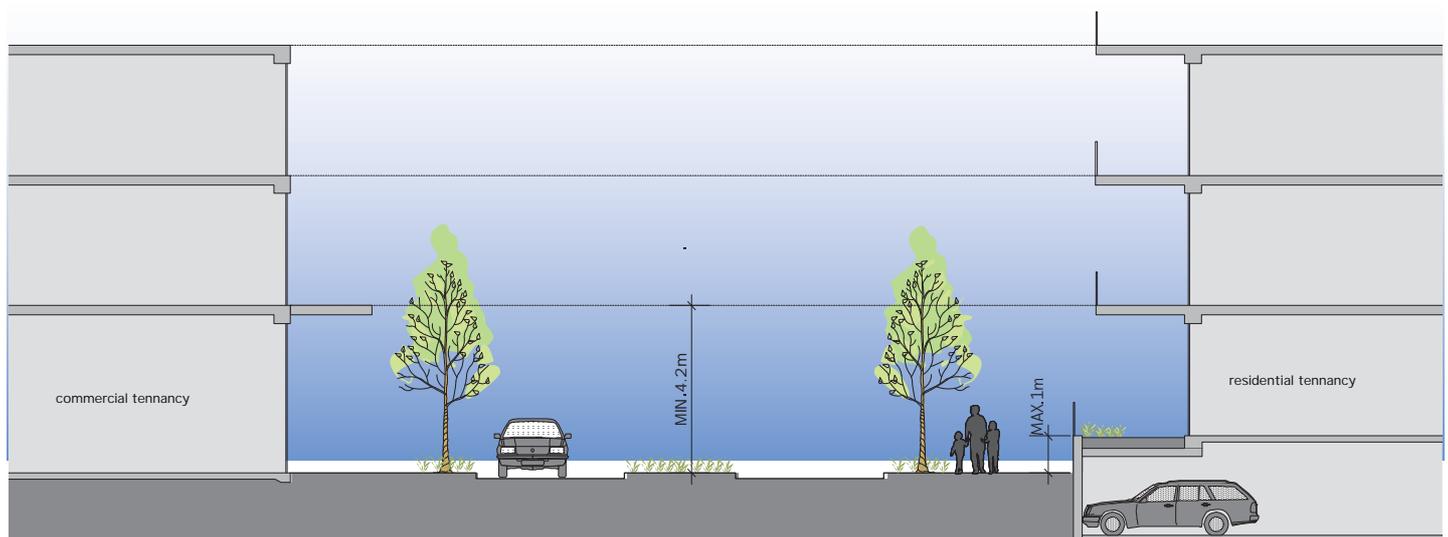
ROWE AVENUE FLOOR LEVEL DIAGRAM. . MAXIMUM 1m STEP-UP AT GROUND FLOOR FROM STREET LEVEL FOR RESIDENTIAL USES PERMITTED.
